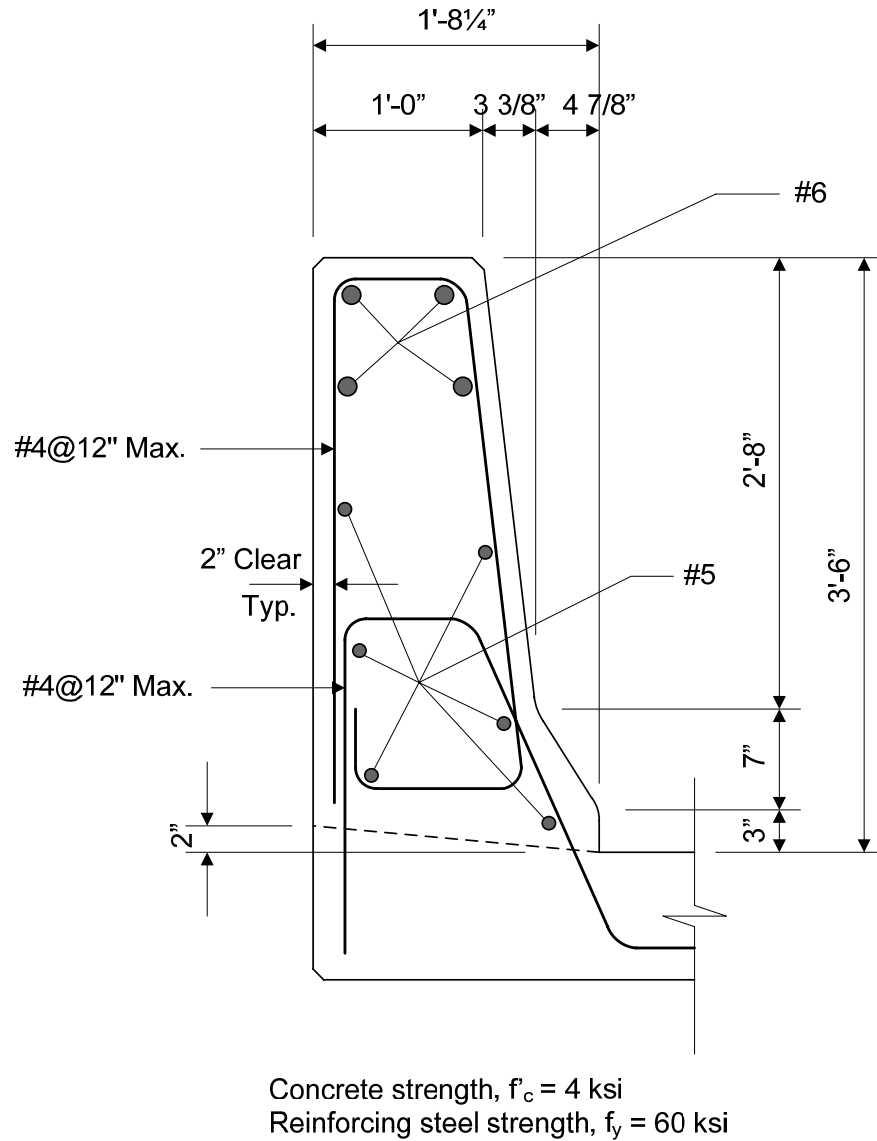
Typical Concrete Barrier, Approved for Test Level 5
